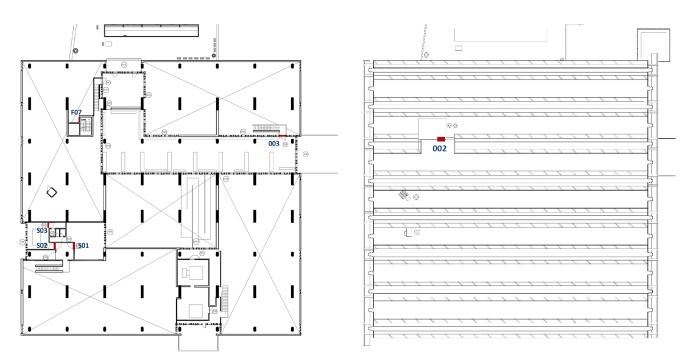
Sample location for material testing of Paint - Second Floor (L); Terrace Level (R)
